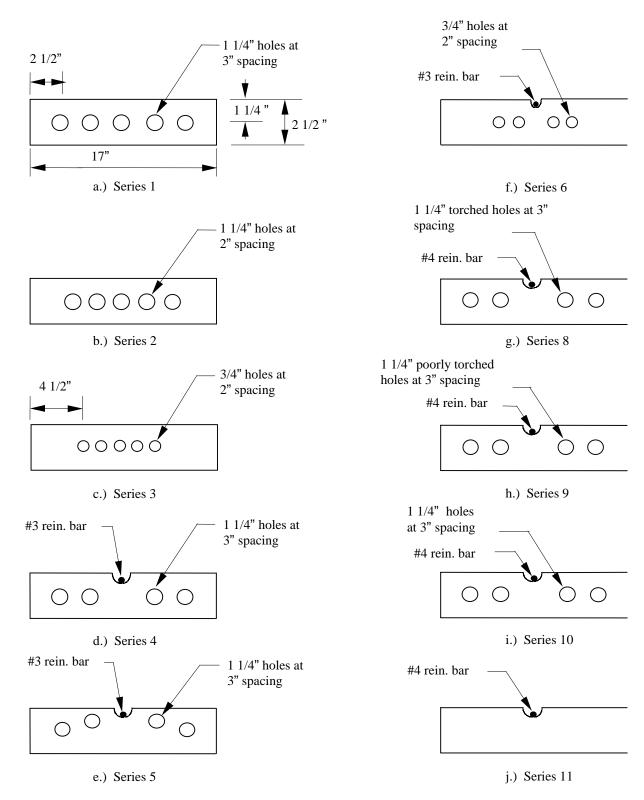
Details of hole arrangements used in push-out tests (1 in.=25.4 mm)
